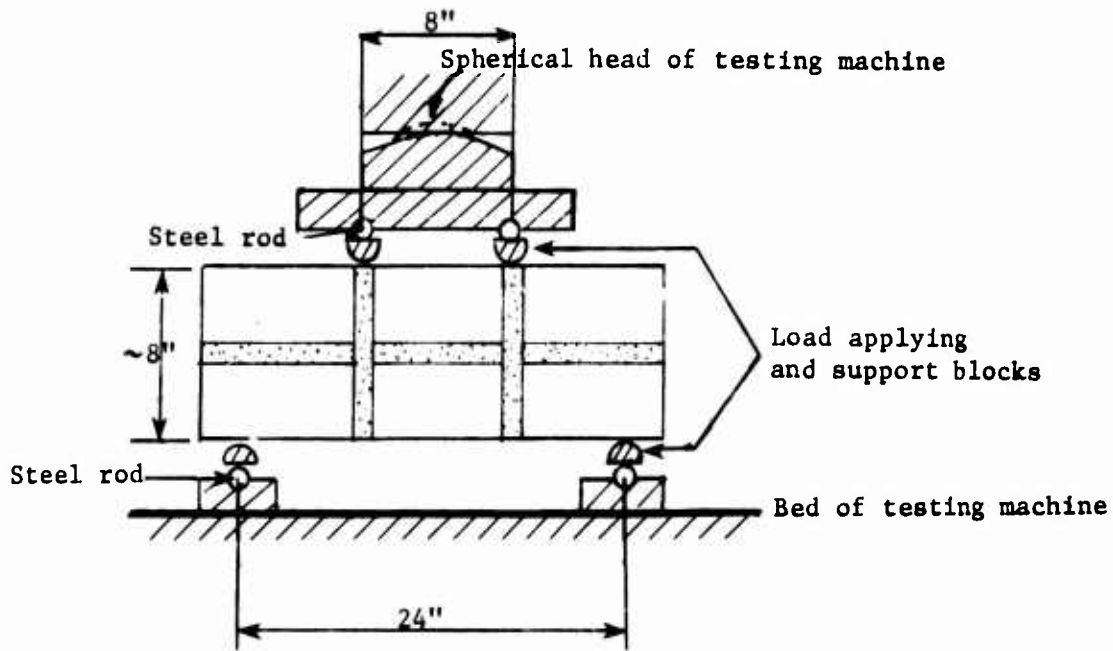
Brick Beam Flexural Test, Third-Point Loading.
